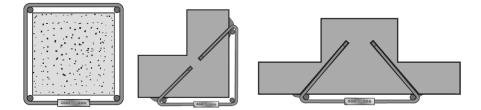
Fixing of steel stirrups in retrofitting of existing construction works
